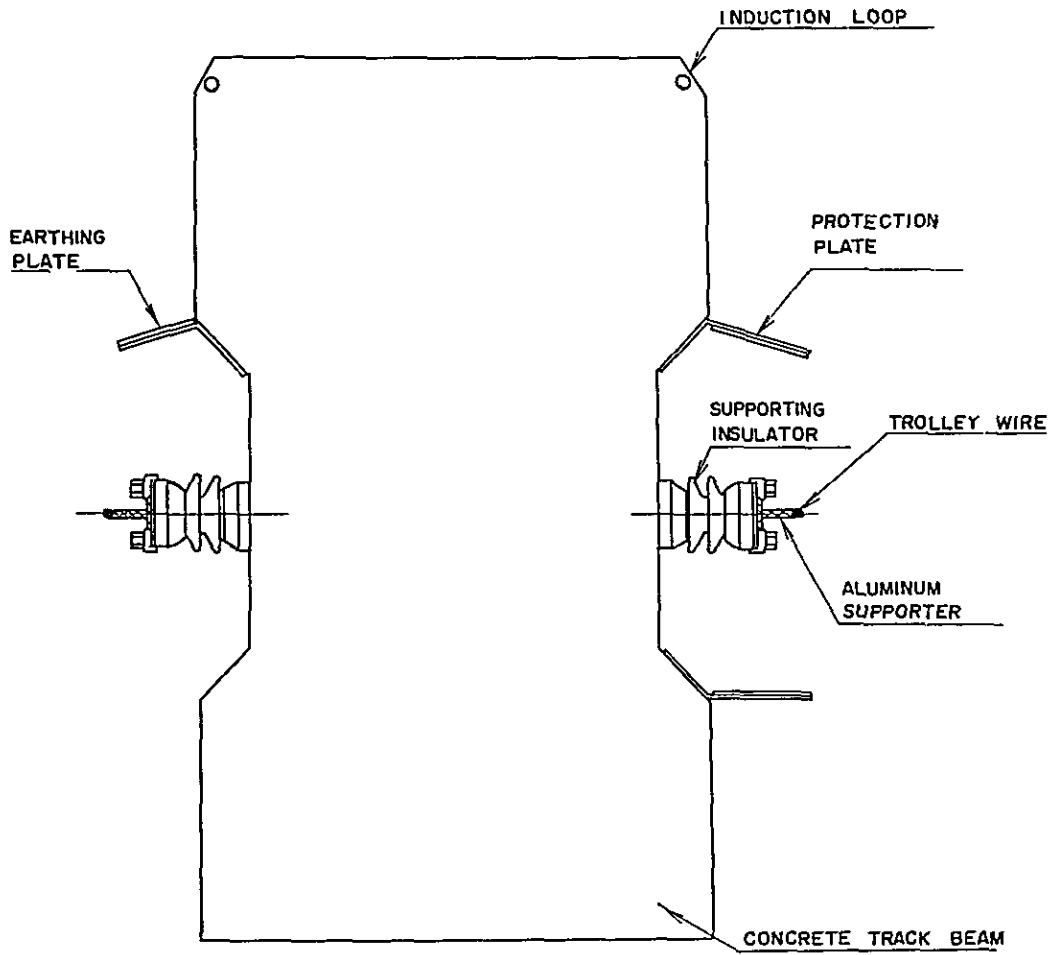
Installing of electric power supplying rail and earthing plate
